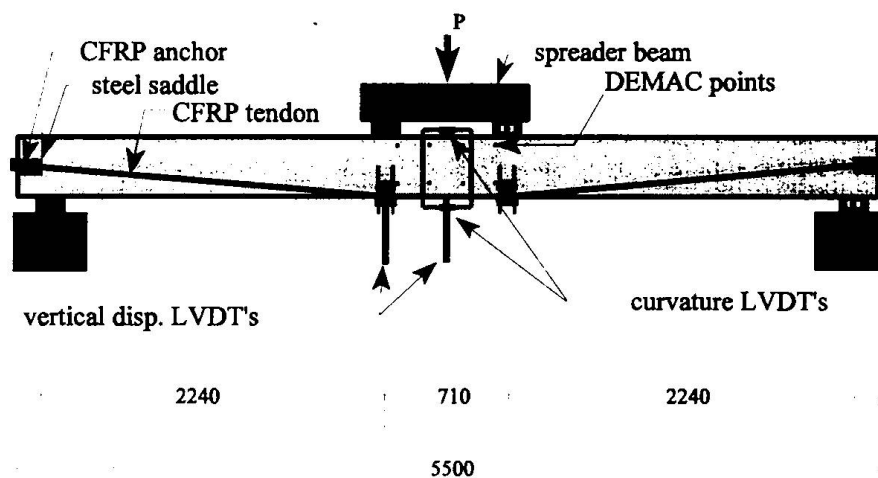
Schematic diagram of the prestressed beams strengthened by external CFRP tendons
